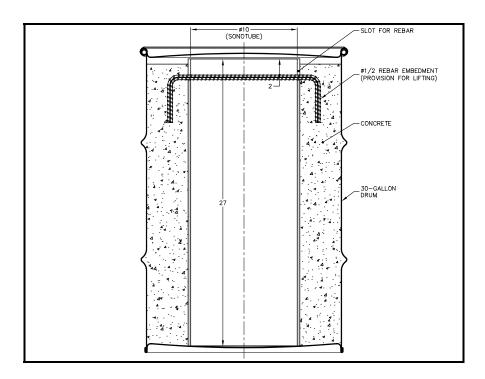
30-Gallon Payload Drum Filled with Concrete
